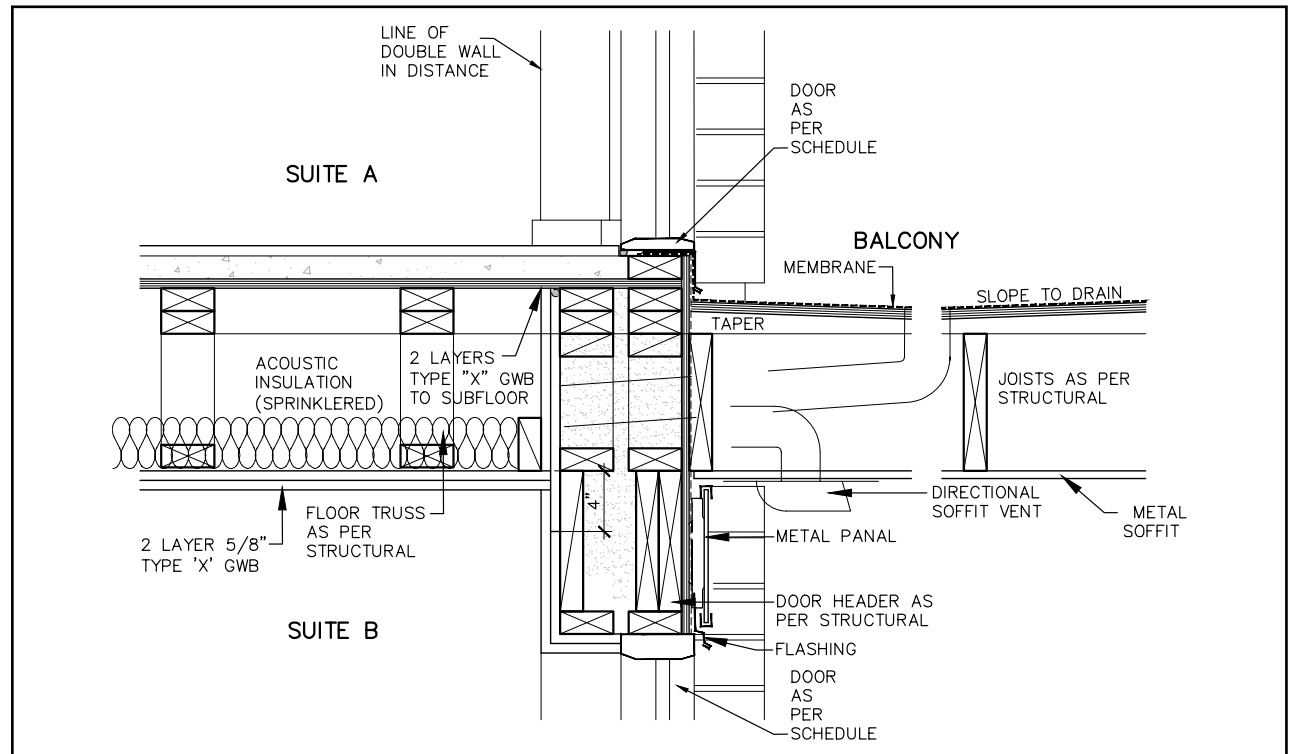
Detail showing exterior balconies supported on projecting PSL beams
